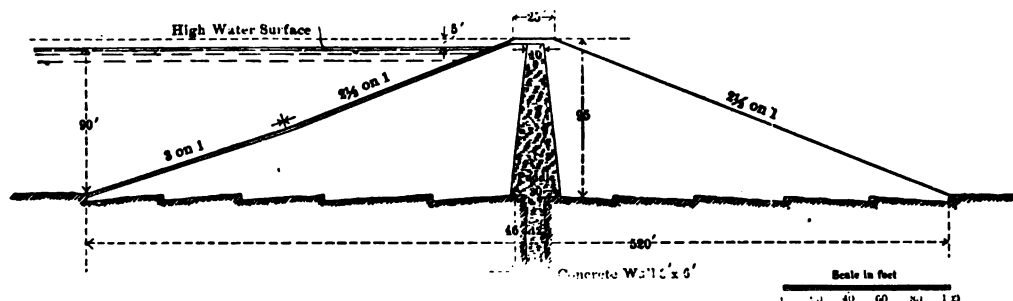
†—CROSS-SECTION OF PILARCITOS DAM.
